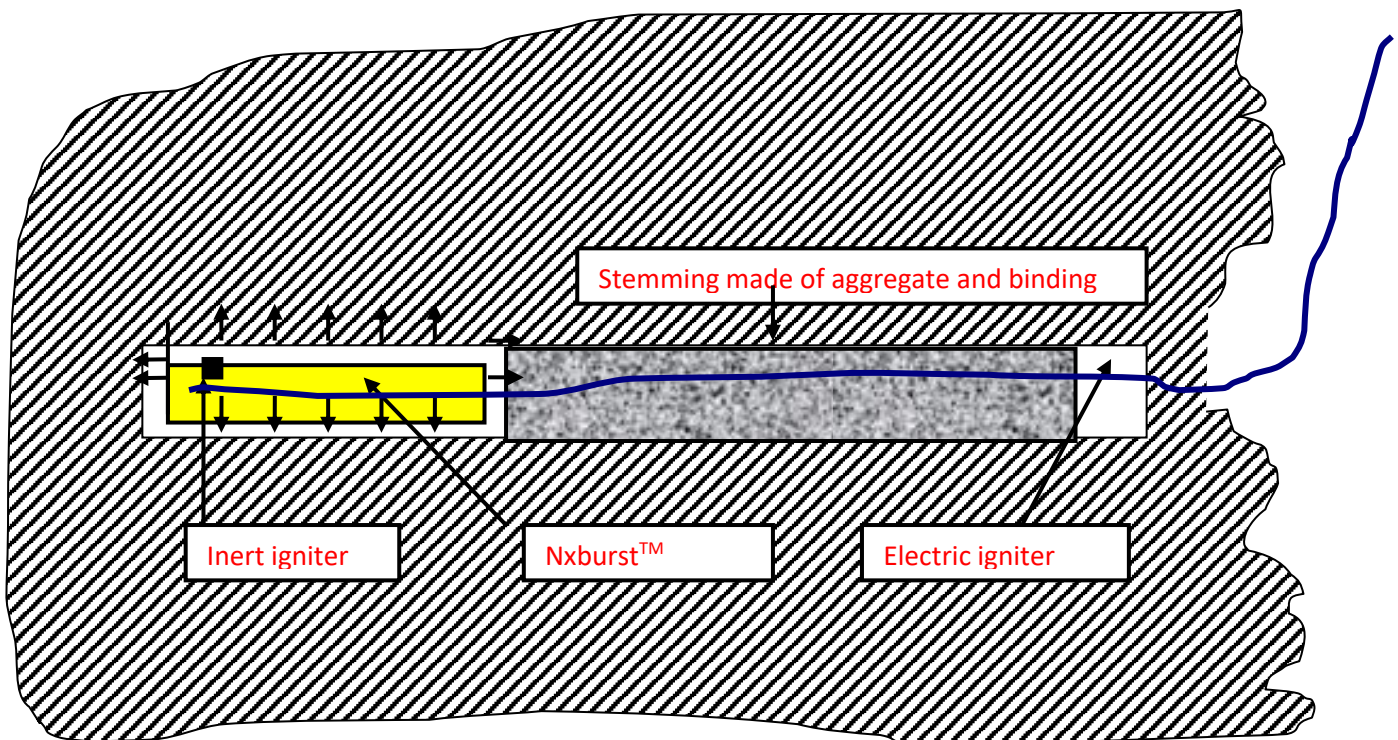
The Nxburst™ Cartridge inserted in a drill hole
